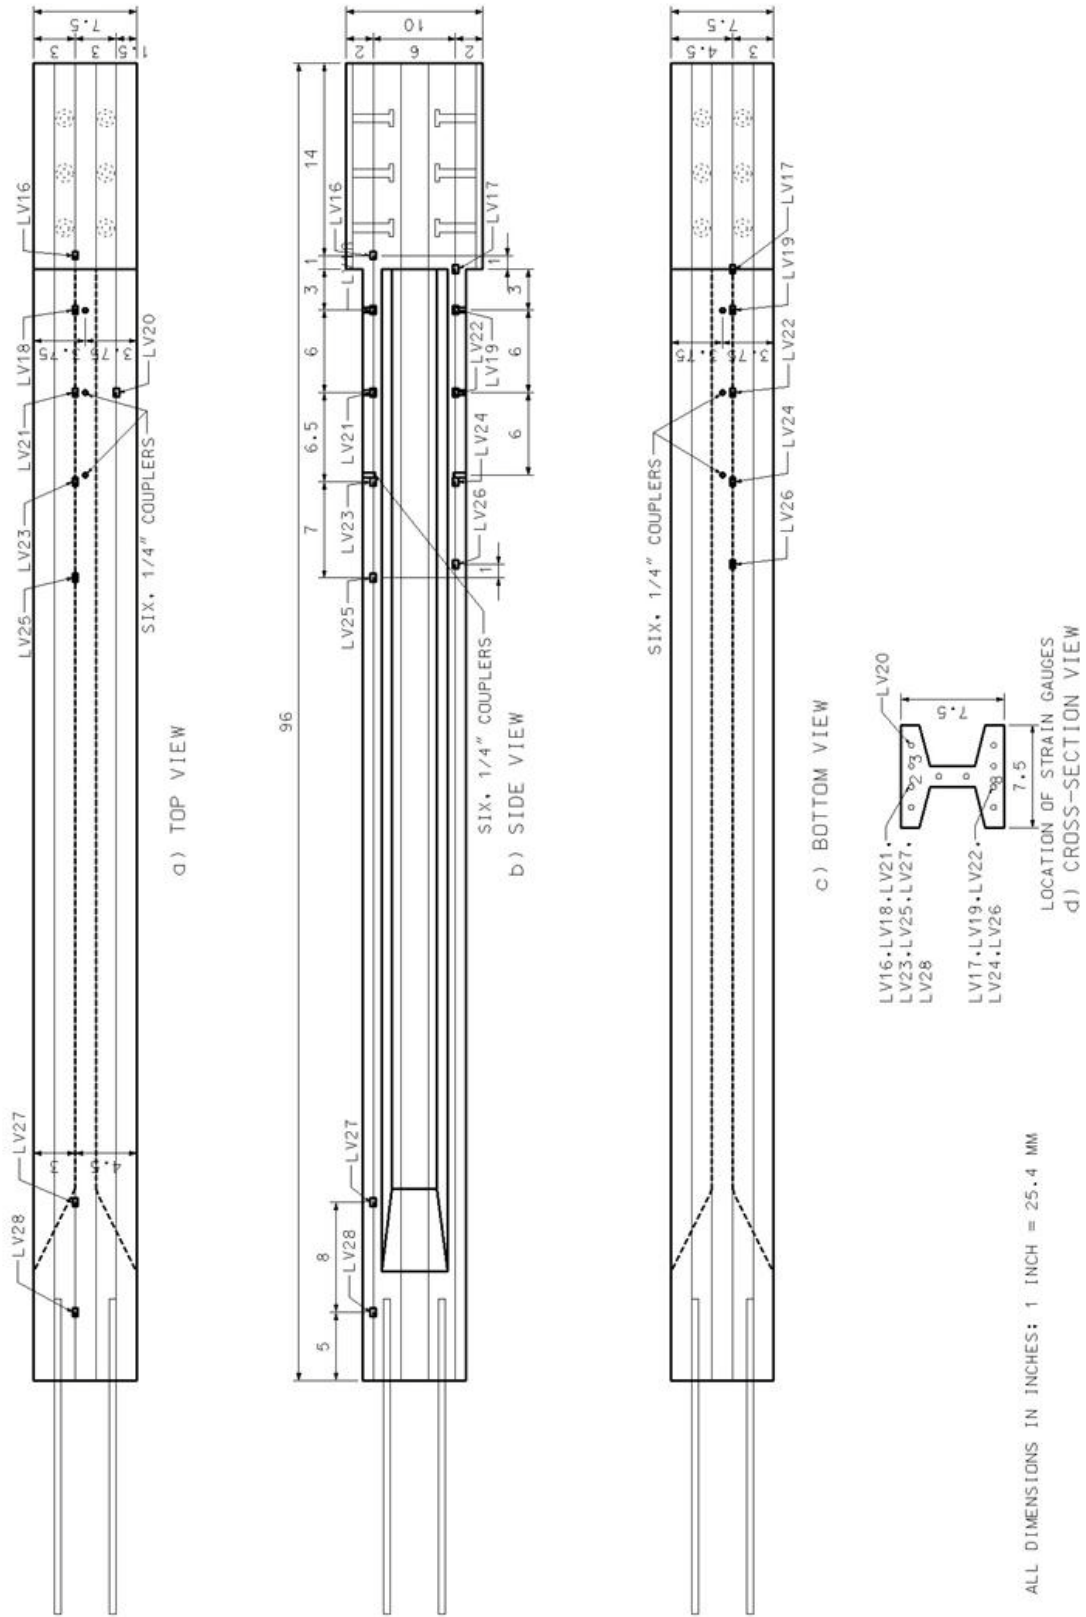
Details of instrumentation used for 8-ft (2.4-m) long UHPC laboratory test unit L2
